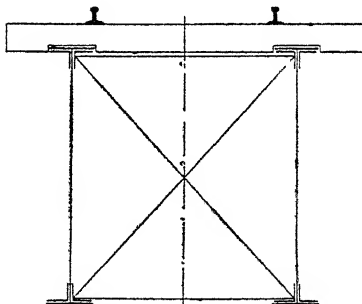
Cross-Section of Deck Plate-Girder Railway Bridge
